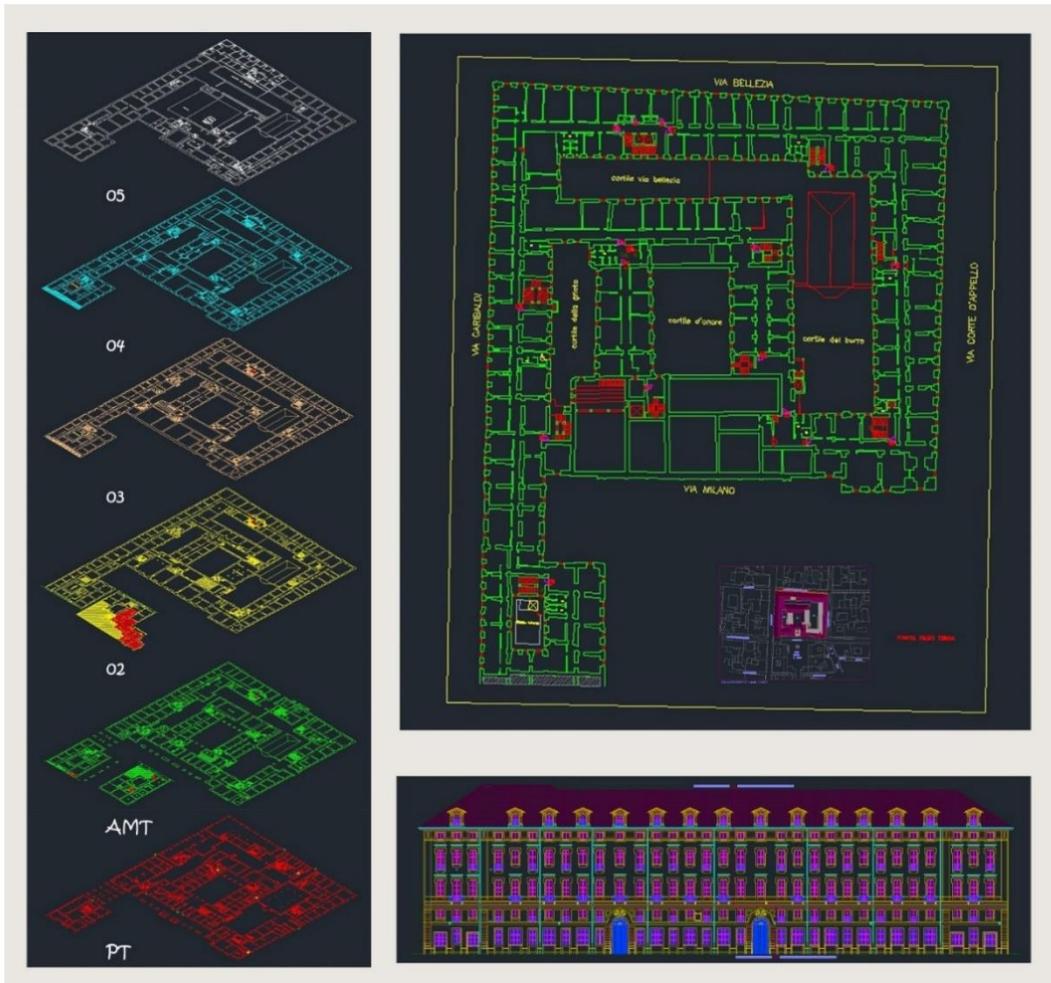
Palazzo di Città plan, axonometric projection and North elevation
